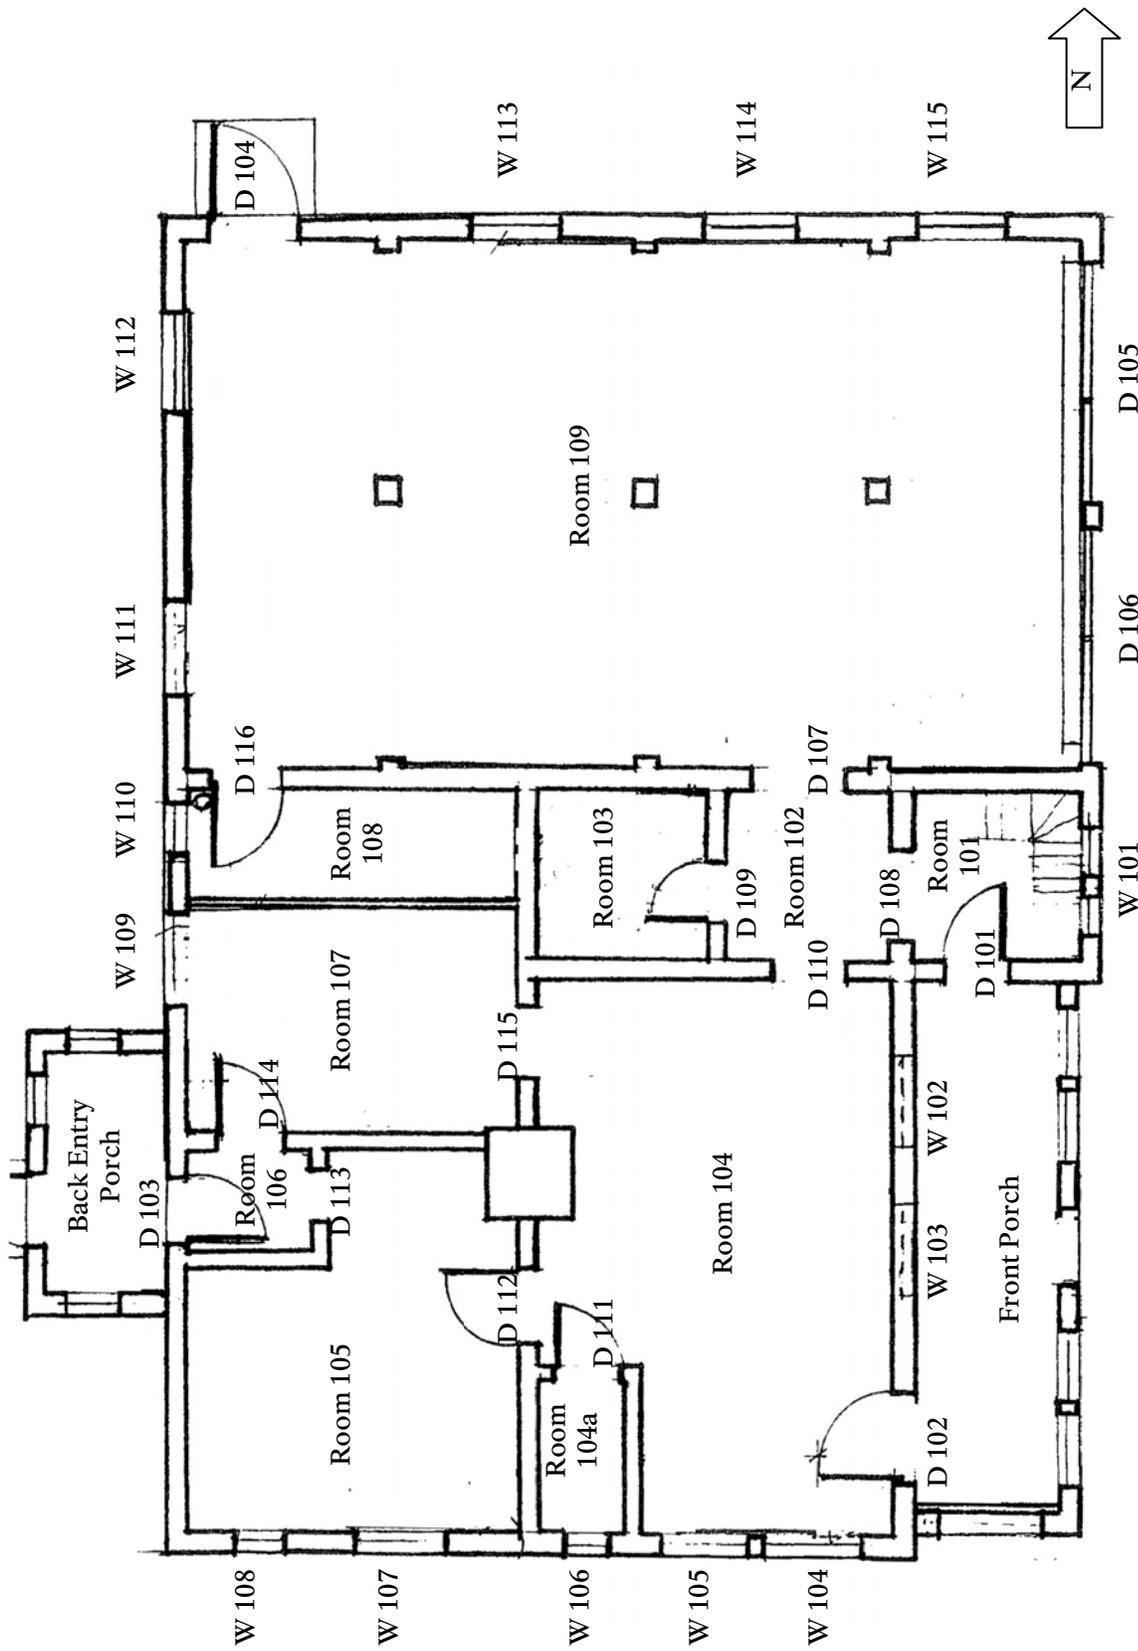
1894 Spermaceti Cove Life-Saving Station, first story plan with room, doorway, and window opening numbers.
